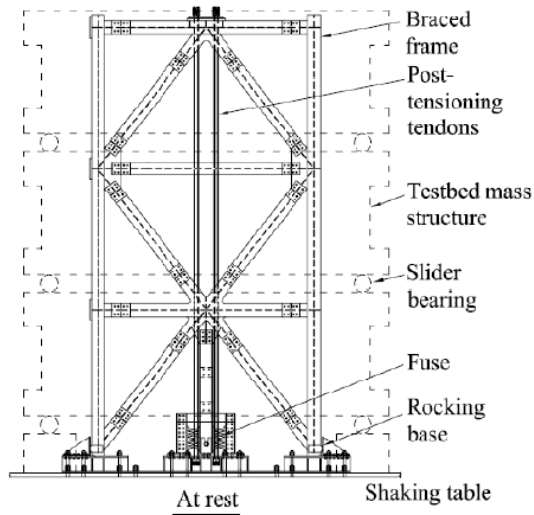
Elevation view of shake-table test specimen (Ma et al. 2011)
